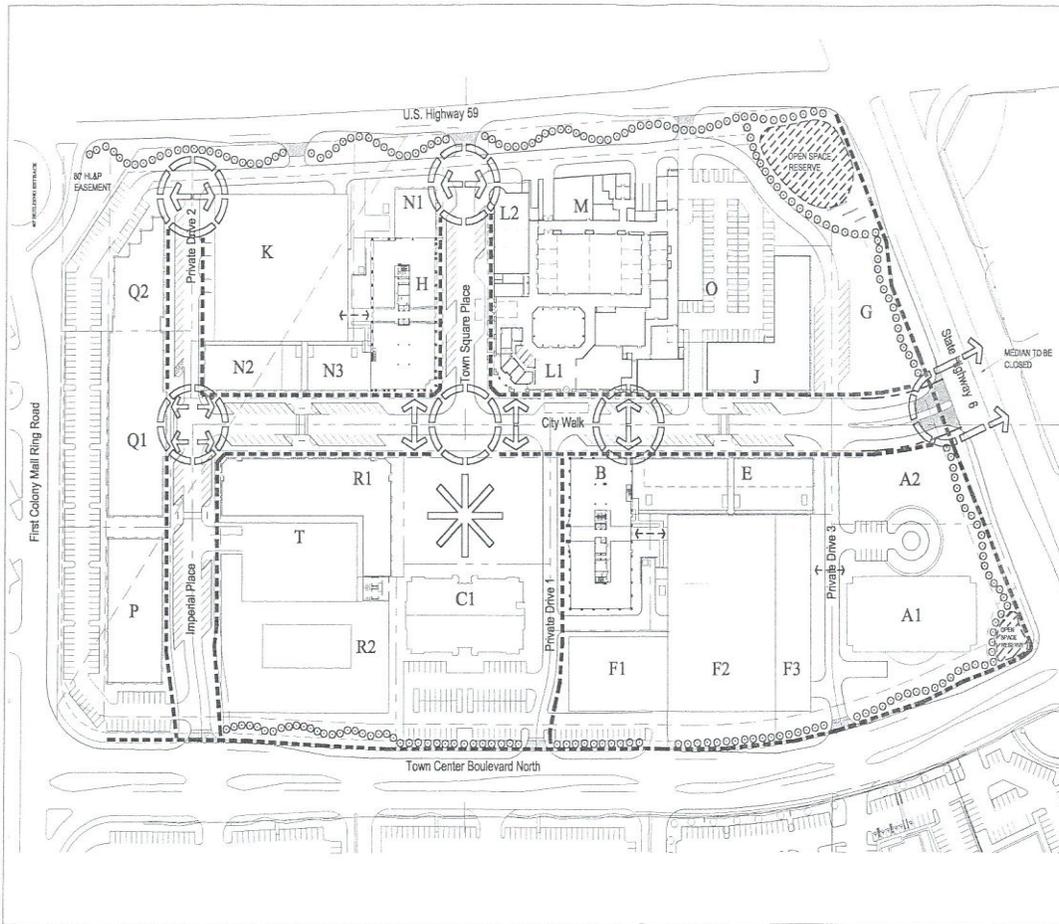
SITE A LAYOUT PLAN
